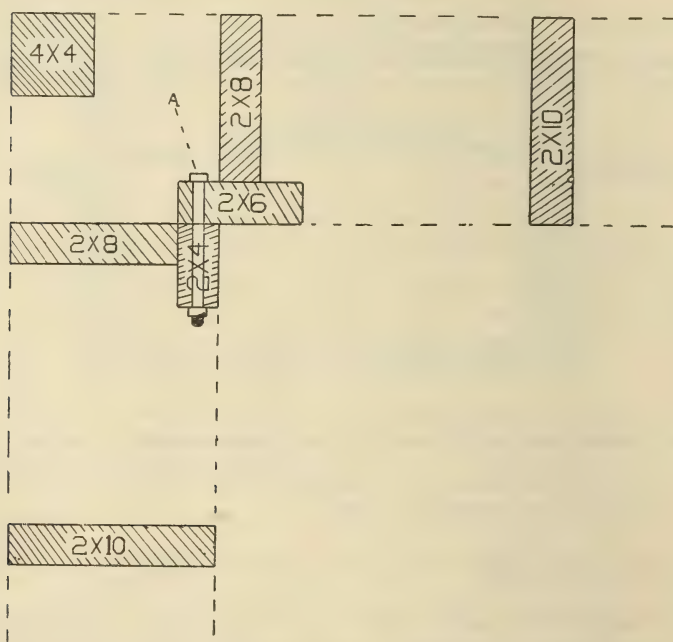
Showing cross section of the studding at the corner of a rectangular silo. Half inch bolts (*a*) should be used to hold the 2 x 4 and 2 x 6 together. These bolts should not be more than 18 inches apart from the bottom up to about the middle of the studding. Above the middle they may be two feet apart; they may be reinforced by thirty penny wire spikes.
